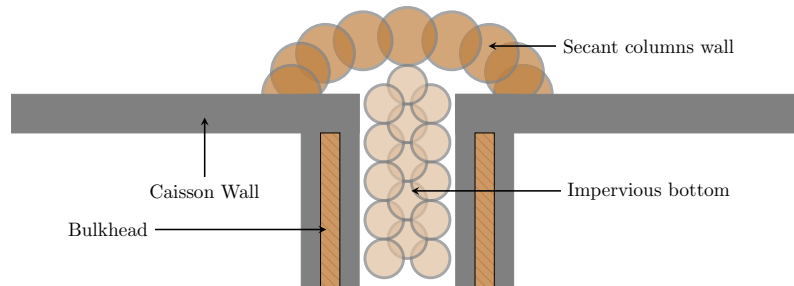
Top view of two caissons combined to each other with grouting techniques (not on scale)
